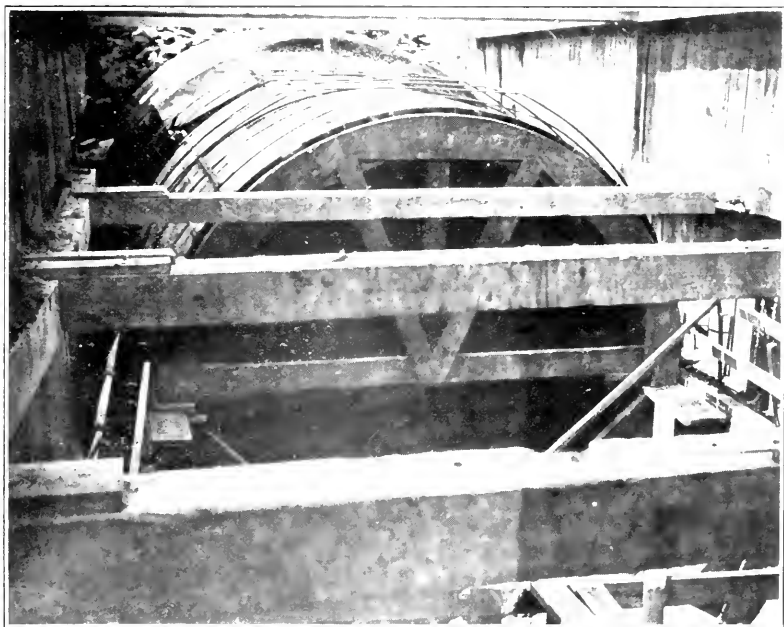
ARCH SKELETON OF 13' 6" SEWER.
